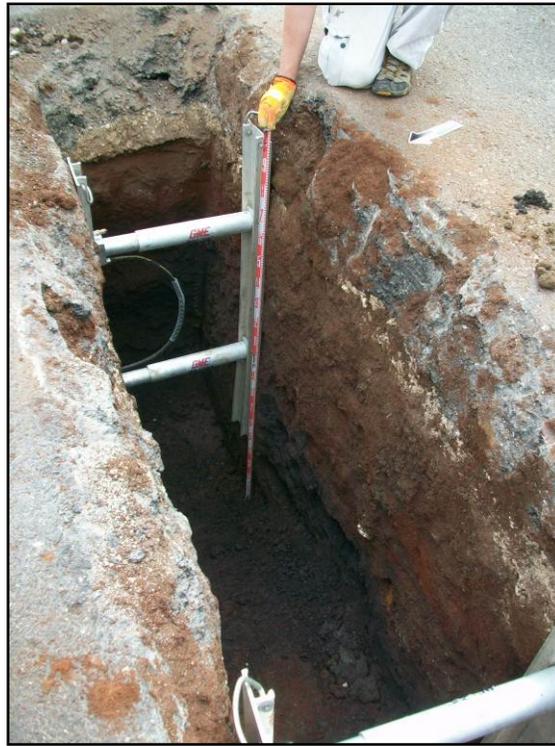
Photograph of the south profile wall of Trench E7, view to the southeast
